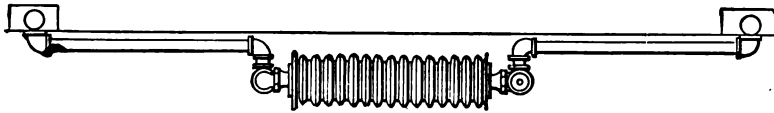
Plan, Two-Pipe Radiator Connection, Risers Concealed
